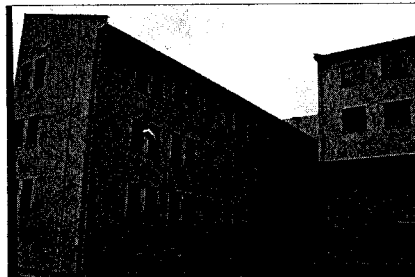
North wing with shear walls of the New Police Headquarters after the earthquake (on the left).
